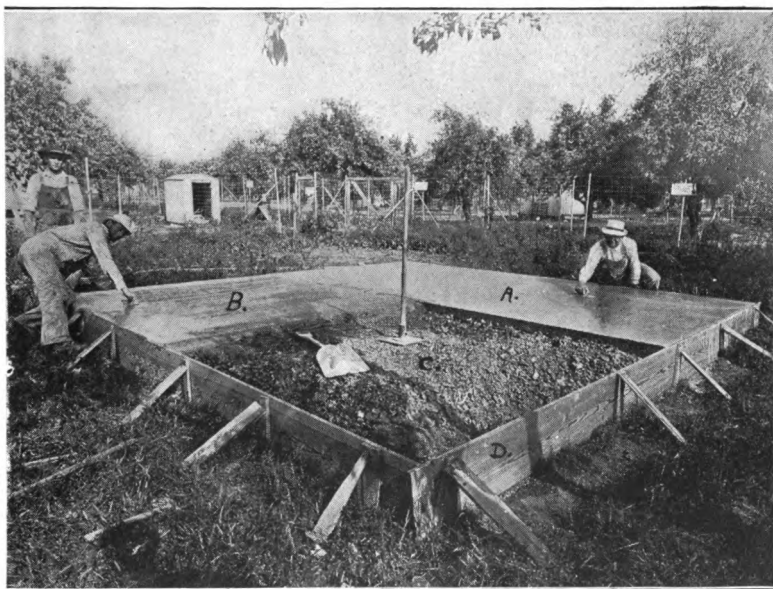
The plan of putting in the form for concrete foundations and floors. Use a board the width of the foundation desired, braced well with stakes. This makes a good and simple form for the foundation. Have the top of the boards level and let this be the top of the floor. Dig a trench four inches wide and twelve inches deep on the inside of the form. Fill this with concrete, and this forms a foundation and makes it rat-proof. D shows the form which has been built to retain the concrete and filler. C shows the cinders and rocks which are used as fillers and for drainage beneath the floor. B is the three inches of concrete which forms the body of the floor. This concrete may be leveled down with a sixteen-foot straight-edge, or a sixteen-foot 2x4, by dragging it along on the edge of the forms. A shows the thin finished coat of pure cement and water mixed and troweled down perfectly smooth.
